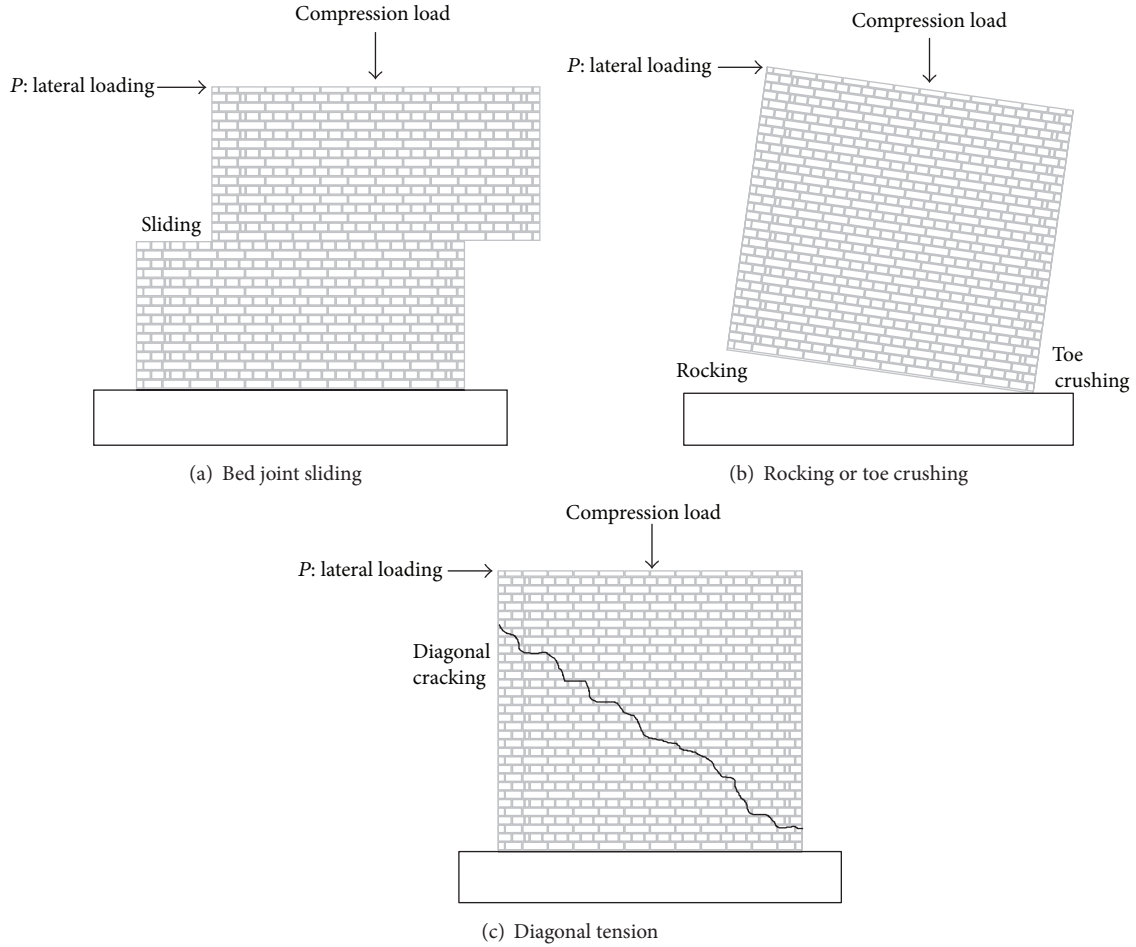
Failure mode of unreinforced masonry wall.
